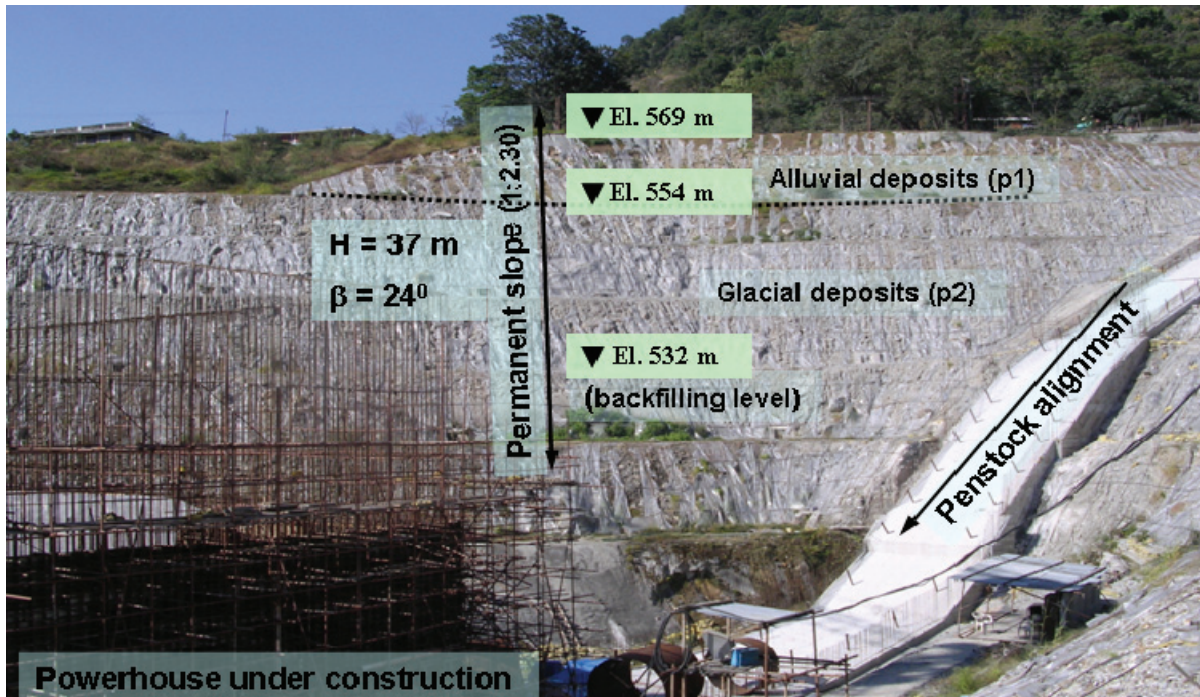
View of the powerhouse slope (photo from November 2004)
